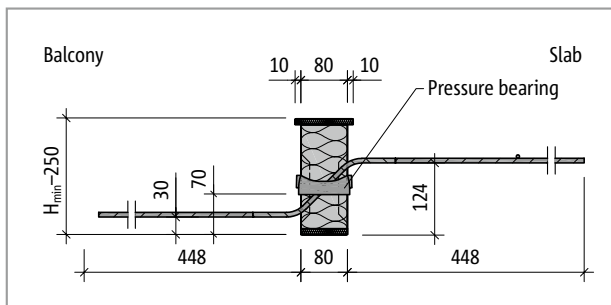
Schöck Isokorb® T type Q-V6: Product section
